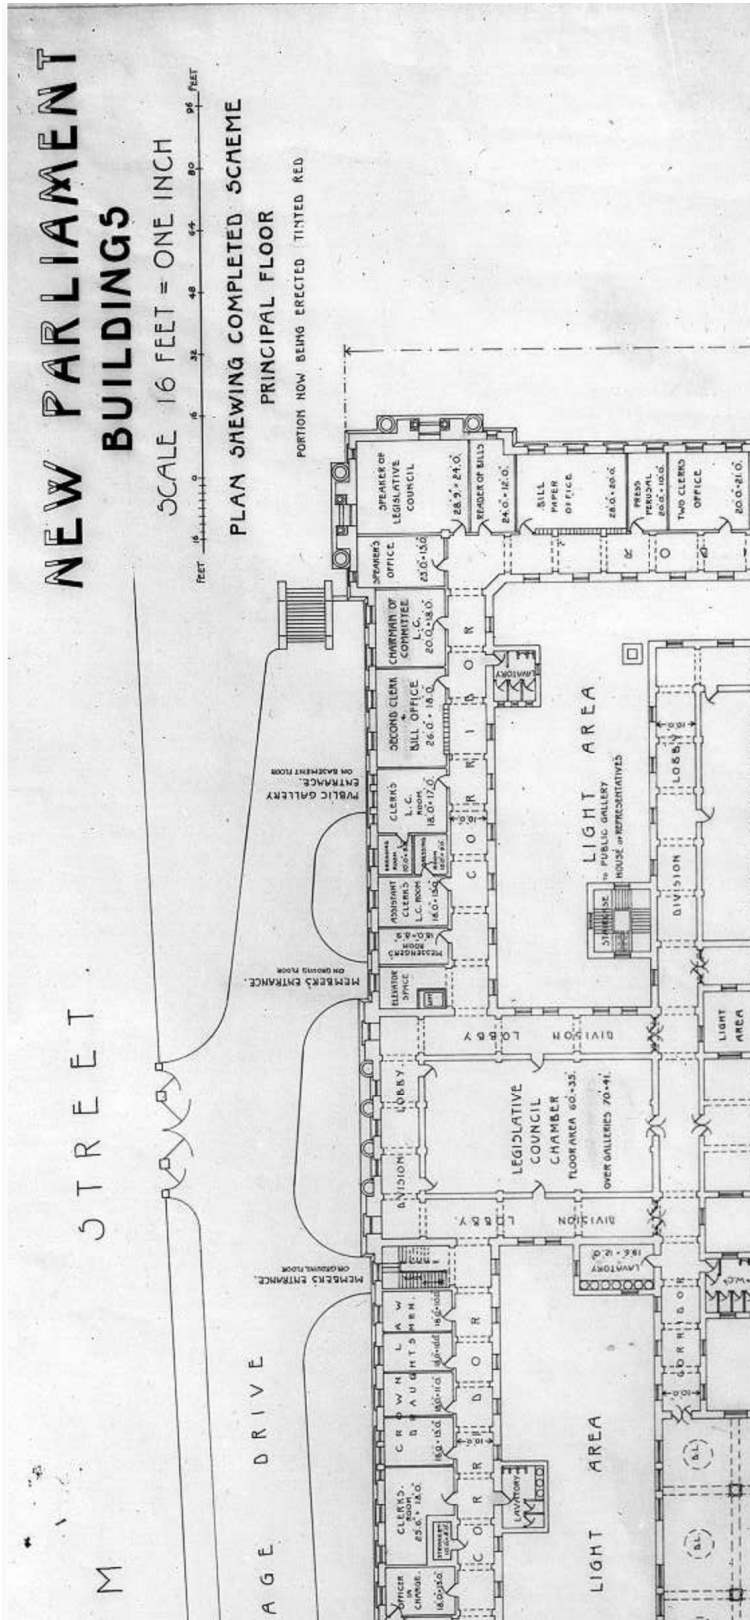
Ground floor plan showing steps to the PL, Tiaki 1/1-020075-G, 1911, S C Smith collection
